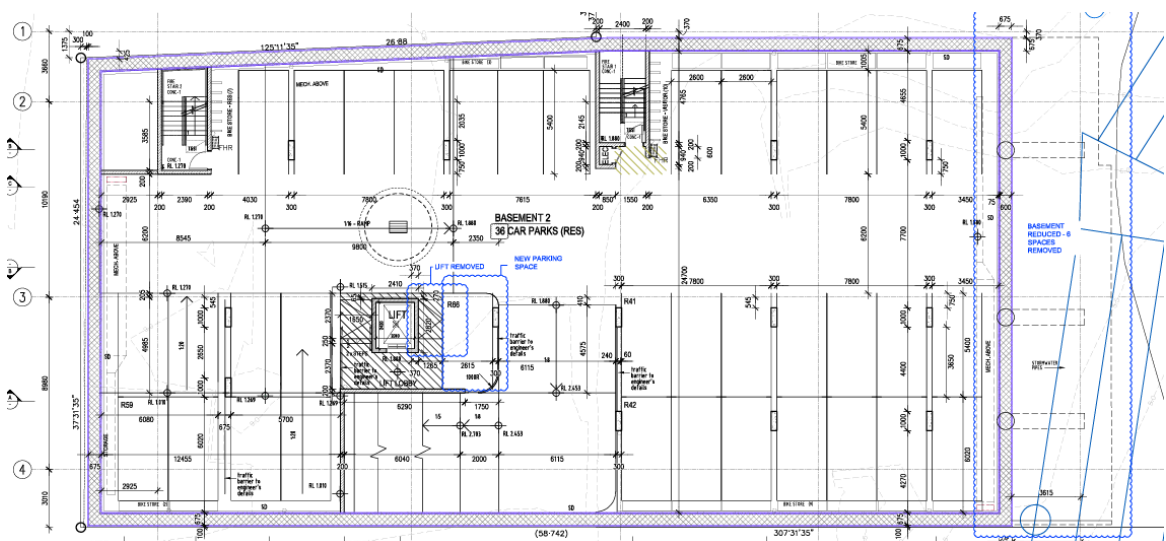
Extract from amended Basement 2 plan - reduced basement footprint and resident parking
